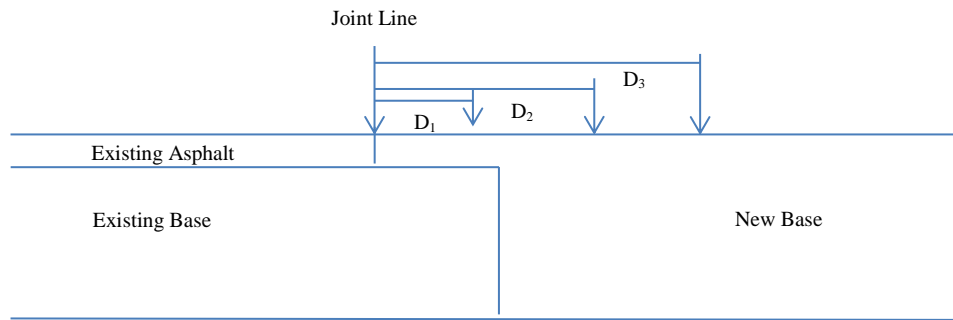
Diagram. New Widening using Notched Longitudinal Joint
